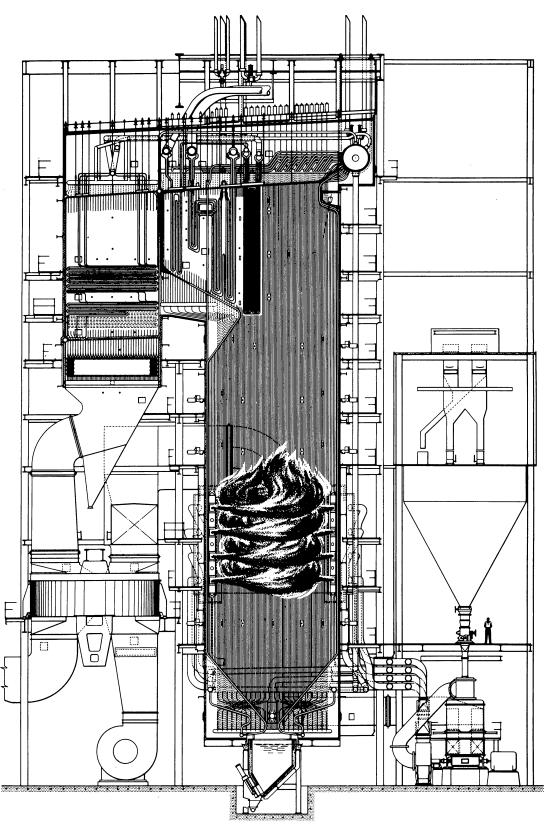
Steam generator, side elevation. Tangential firing system.
